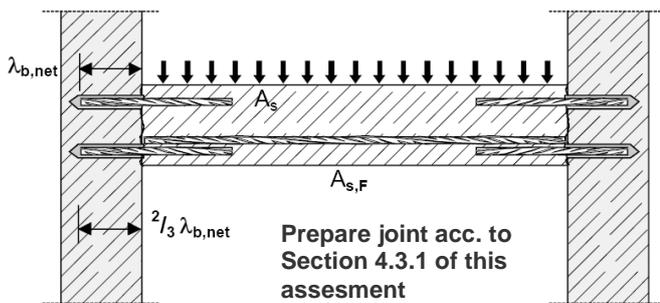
Overlap joint for rebar connections of slabs and beams
